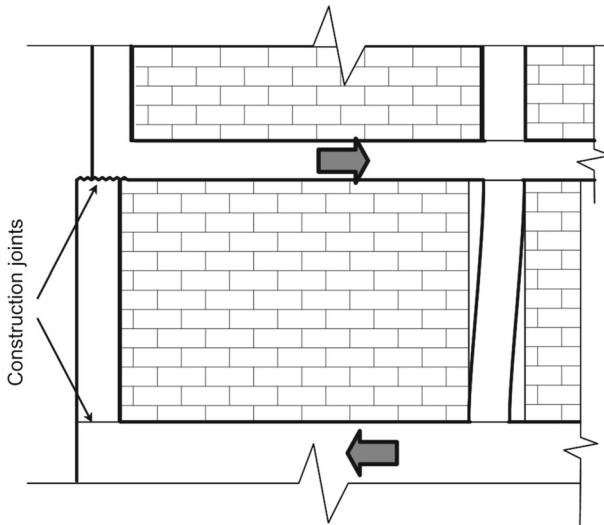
Failure at the construction joint of beam–column connection
